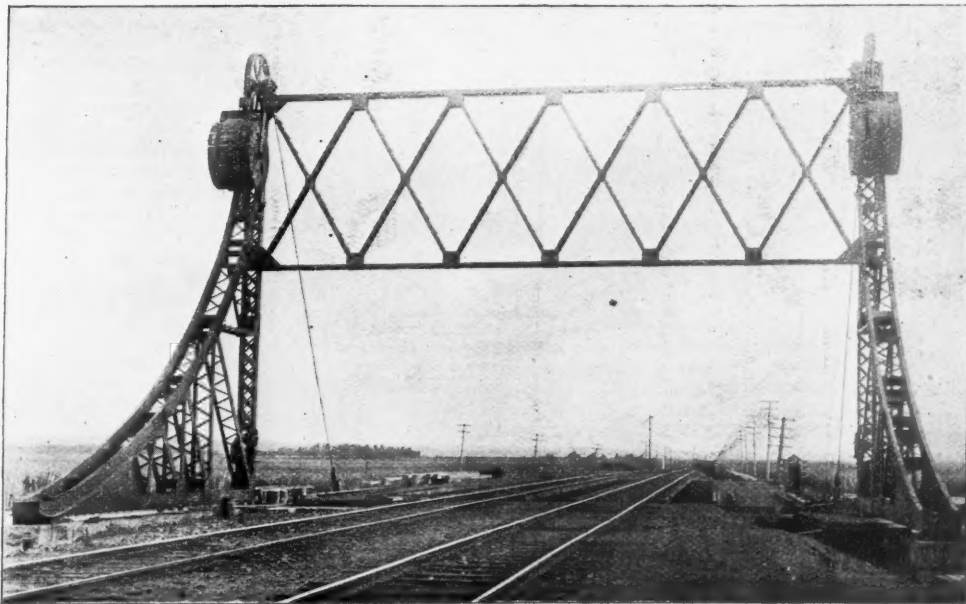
Lift Bridge over Berry's Creek on the Erie Railroad.
